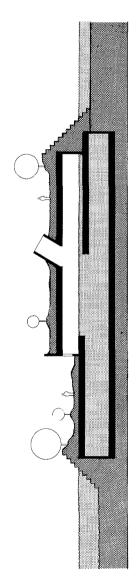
Cross Section of Earth-Covered School Under Flood Conditions
